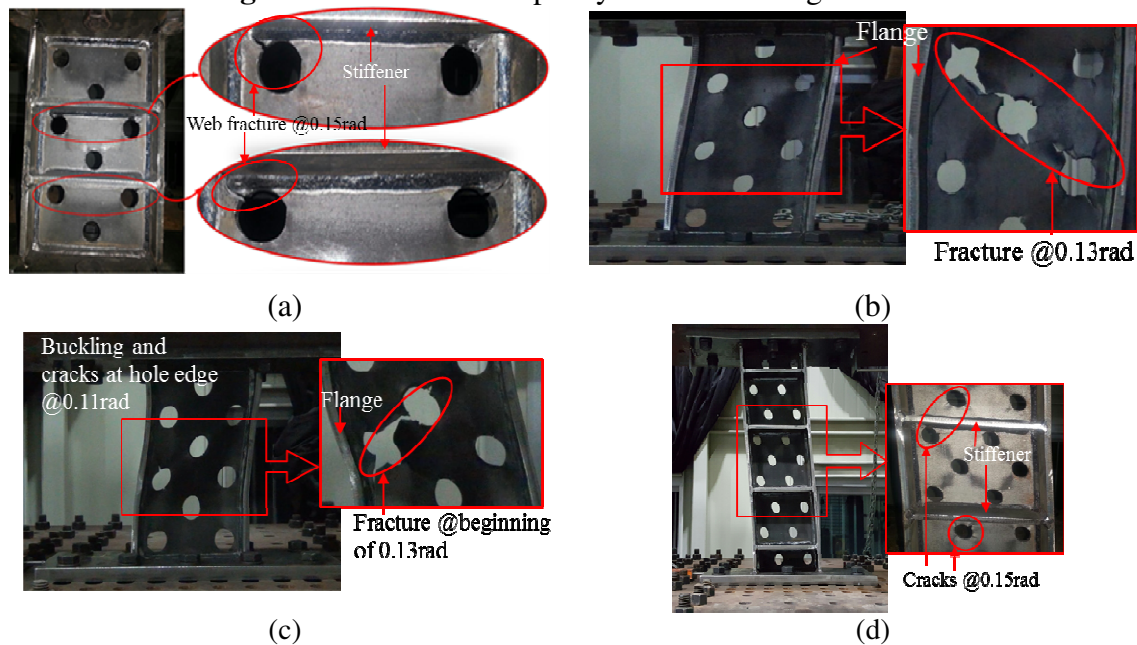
Damage of test specimens: (a) web cracks at hole edge (Specimen S10S1); (b) web cracks at hole edge and flange buckling (Specimen U10S1); (c) web cracks at hole edge and flange buckling (Specimen U15S1); (d) web cracks at hole edge (Specimen S10Sf1)
